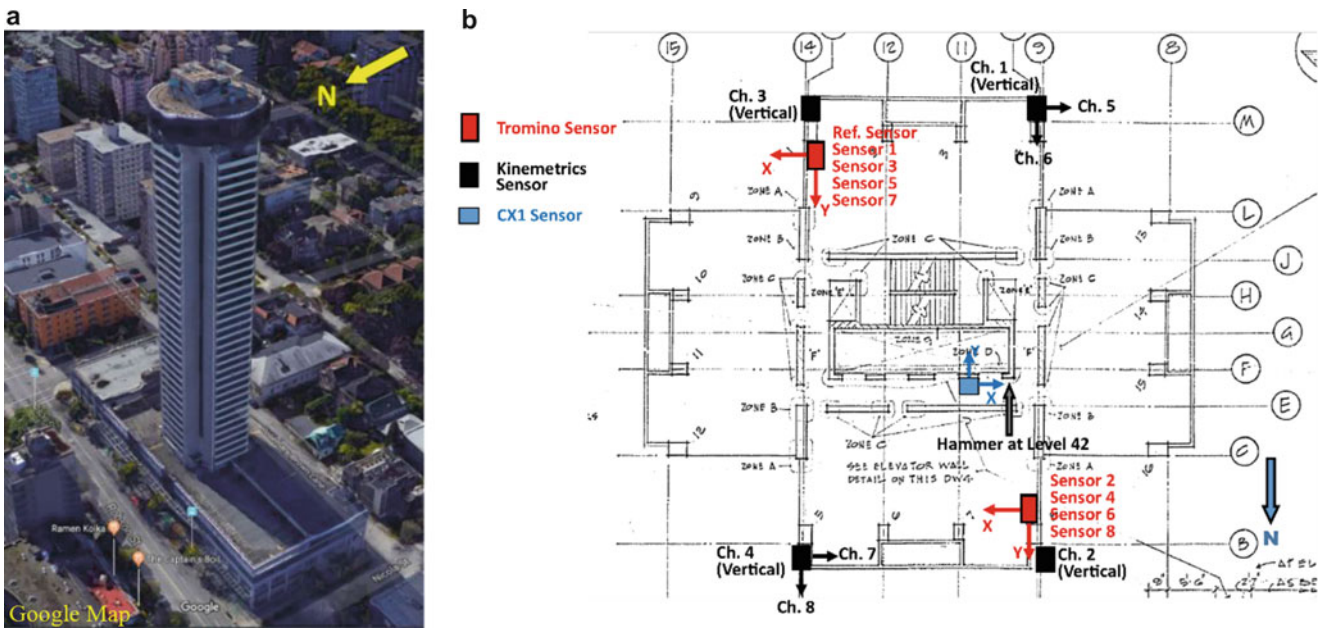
Empire Landmark Tower-Downtown Vancouver: (a) Perspective view, (b) Plan view and sensors' location for vibration tests
